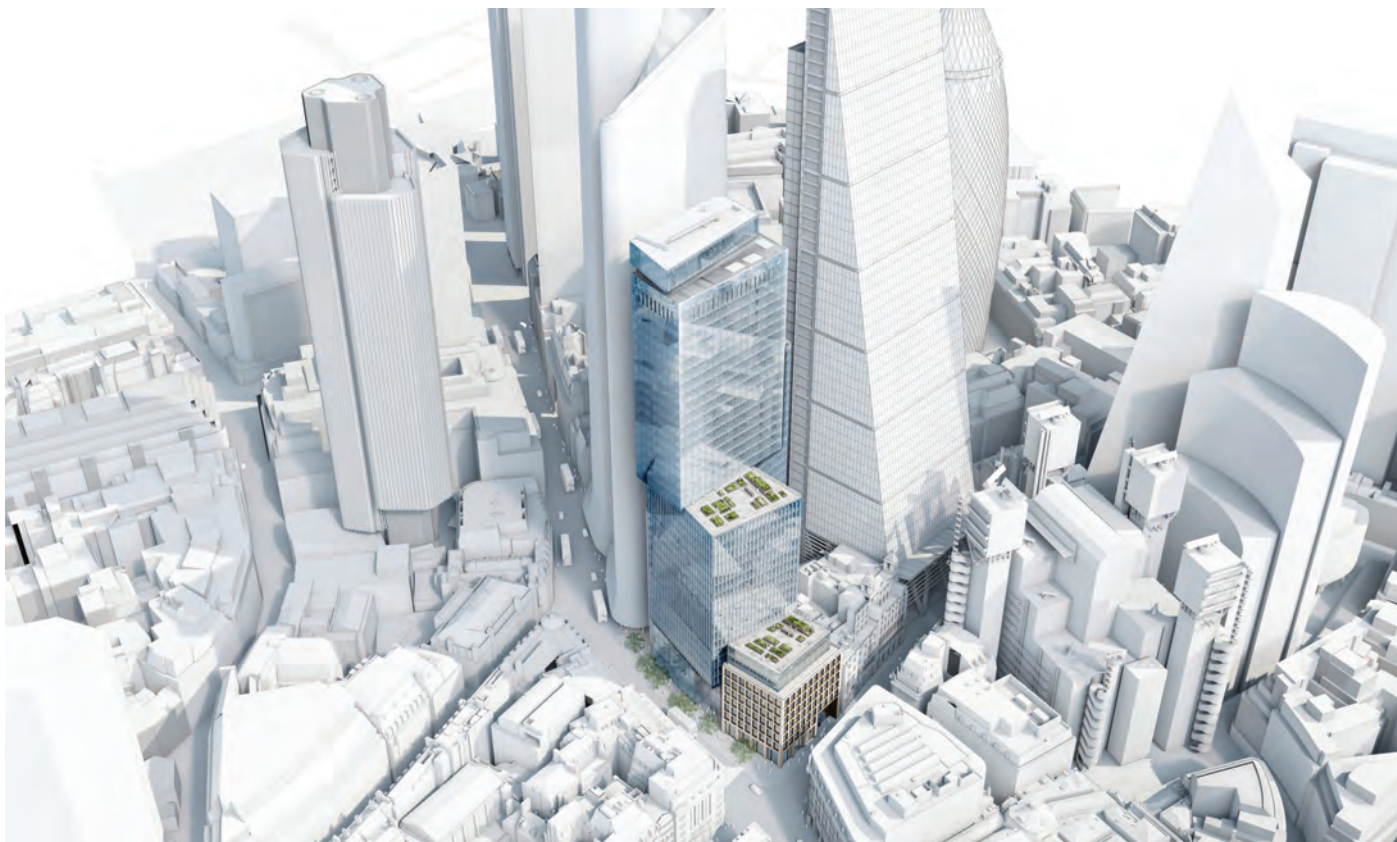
Aerial view of 150 Leadenhall Street (Source: Wilkinson Eyre Architects)
